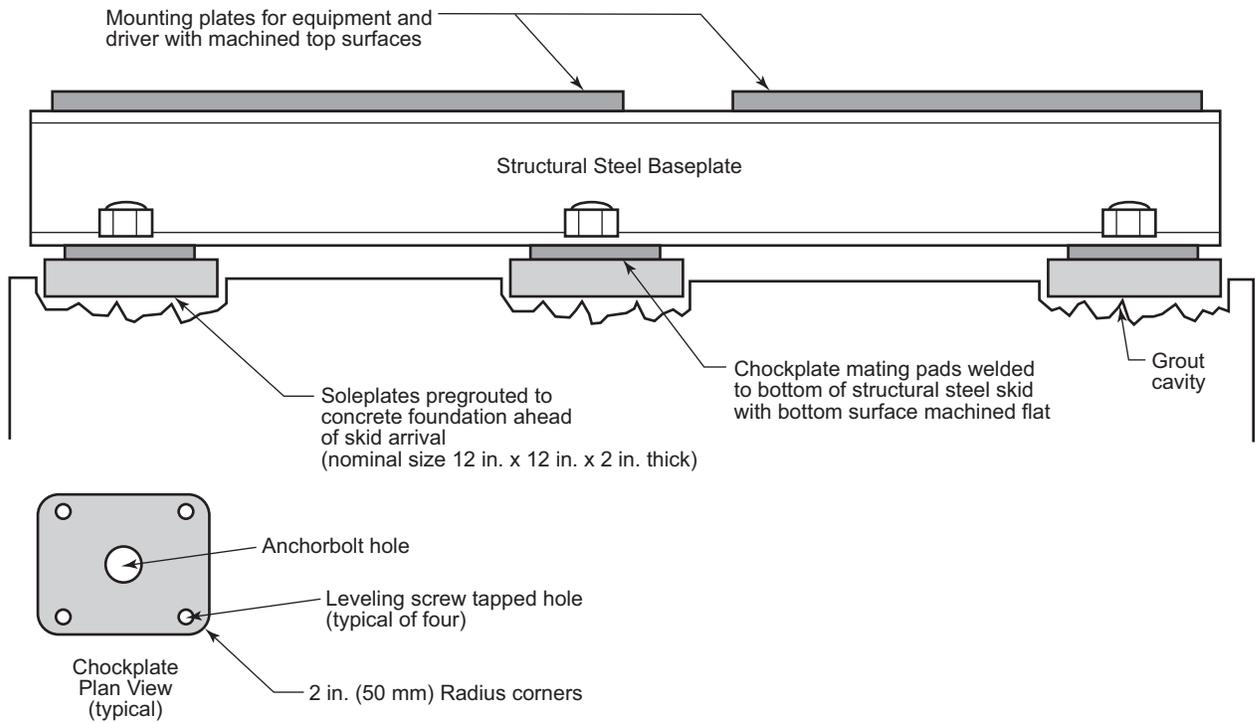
Typical Mounting Plate Arrangement for Baseplate Mounted Special-purpose Equipment
